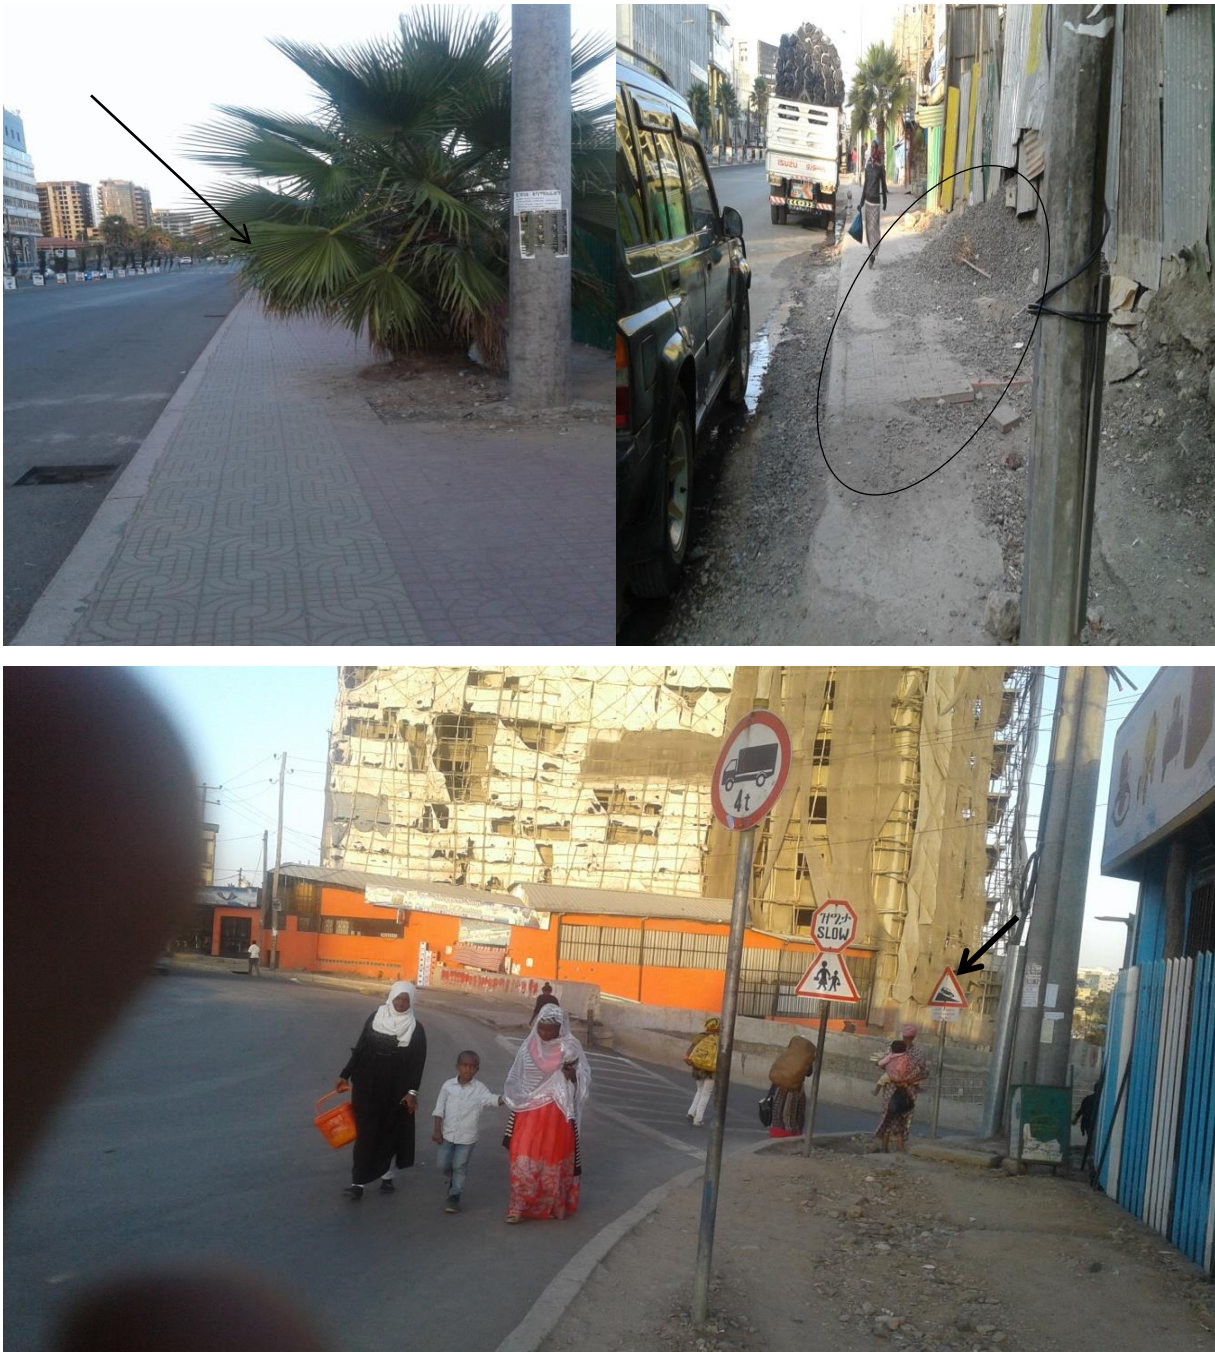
Photo. Uncovered ditch, Long branch of vegetation, construction material on walk way, incorrect placement of warning sign.
